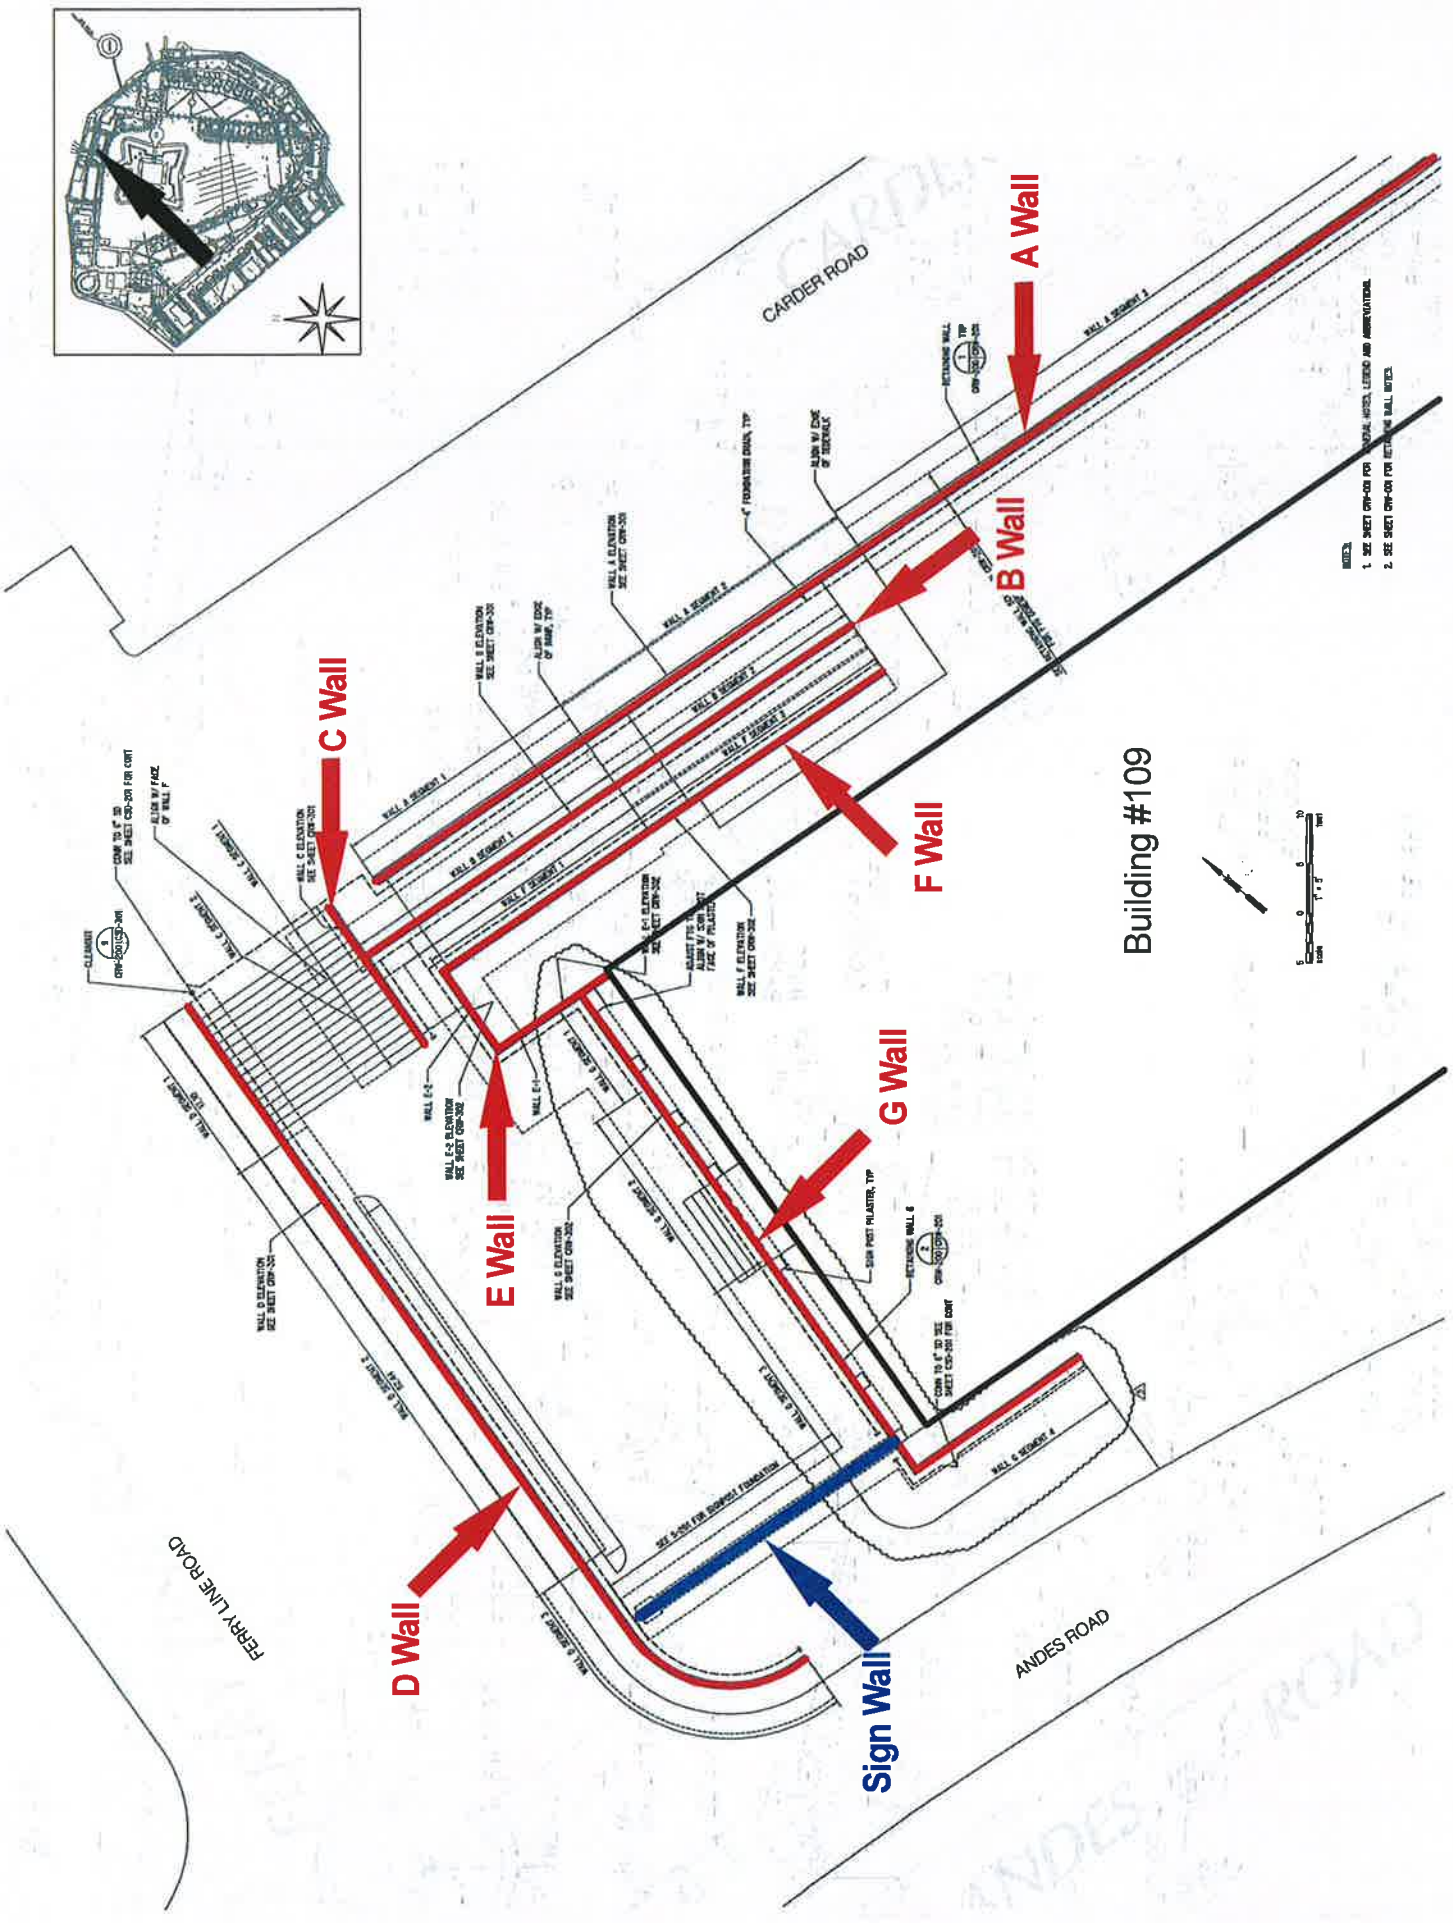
Construction drawing "Retaining Wall Enlargement Plan," Drawing CRW-200 (Soissons Zone, Tile 1).
